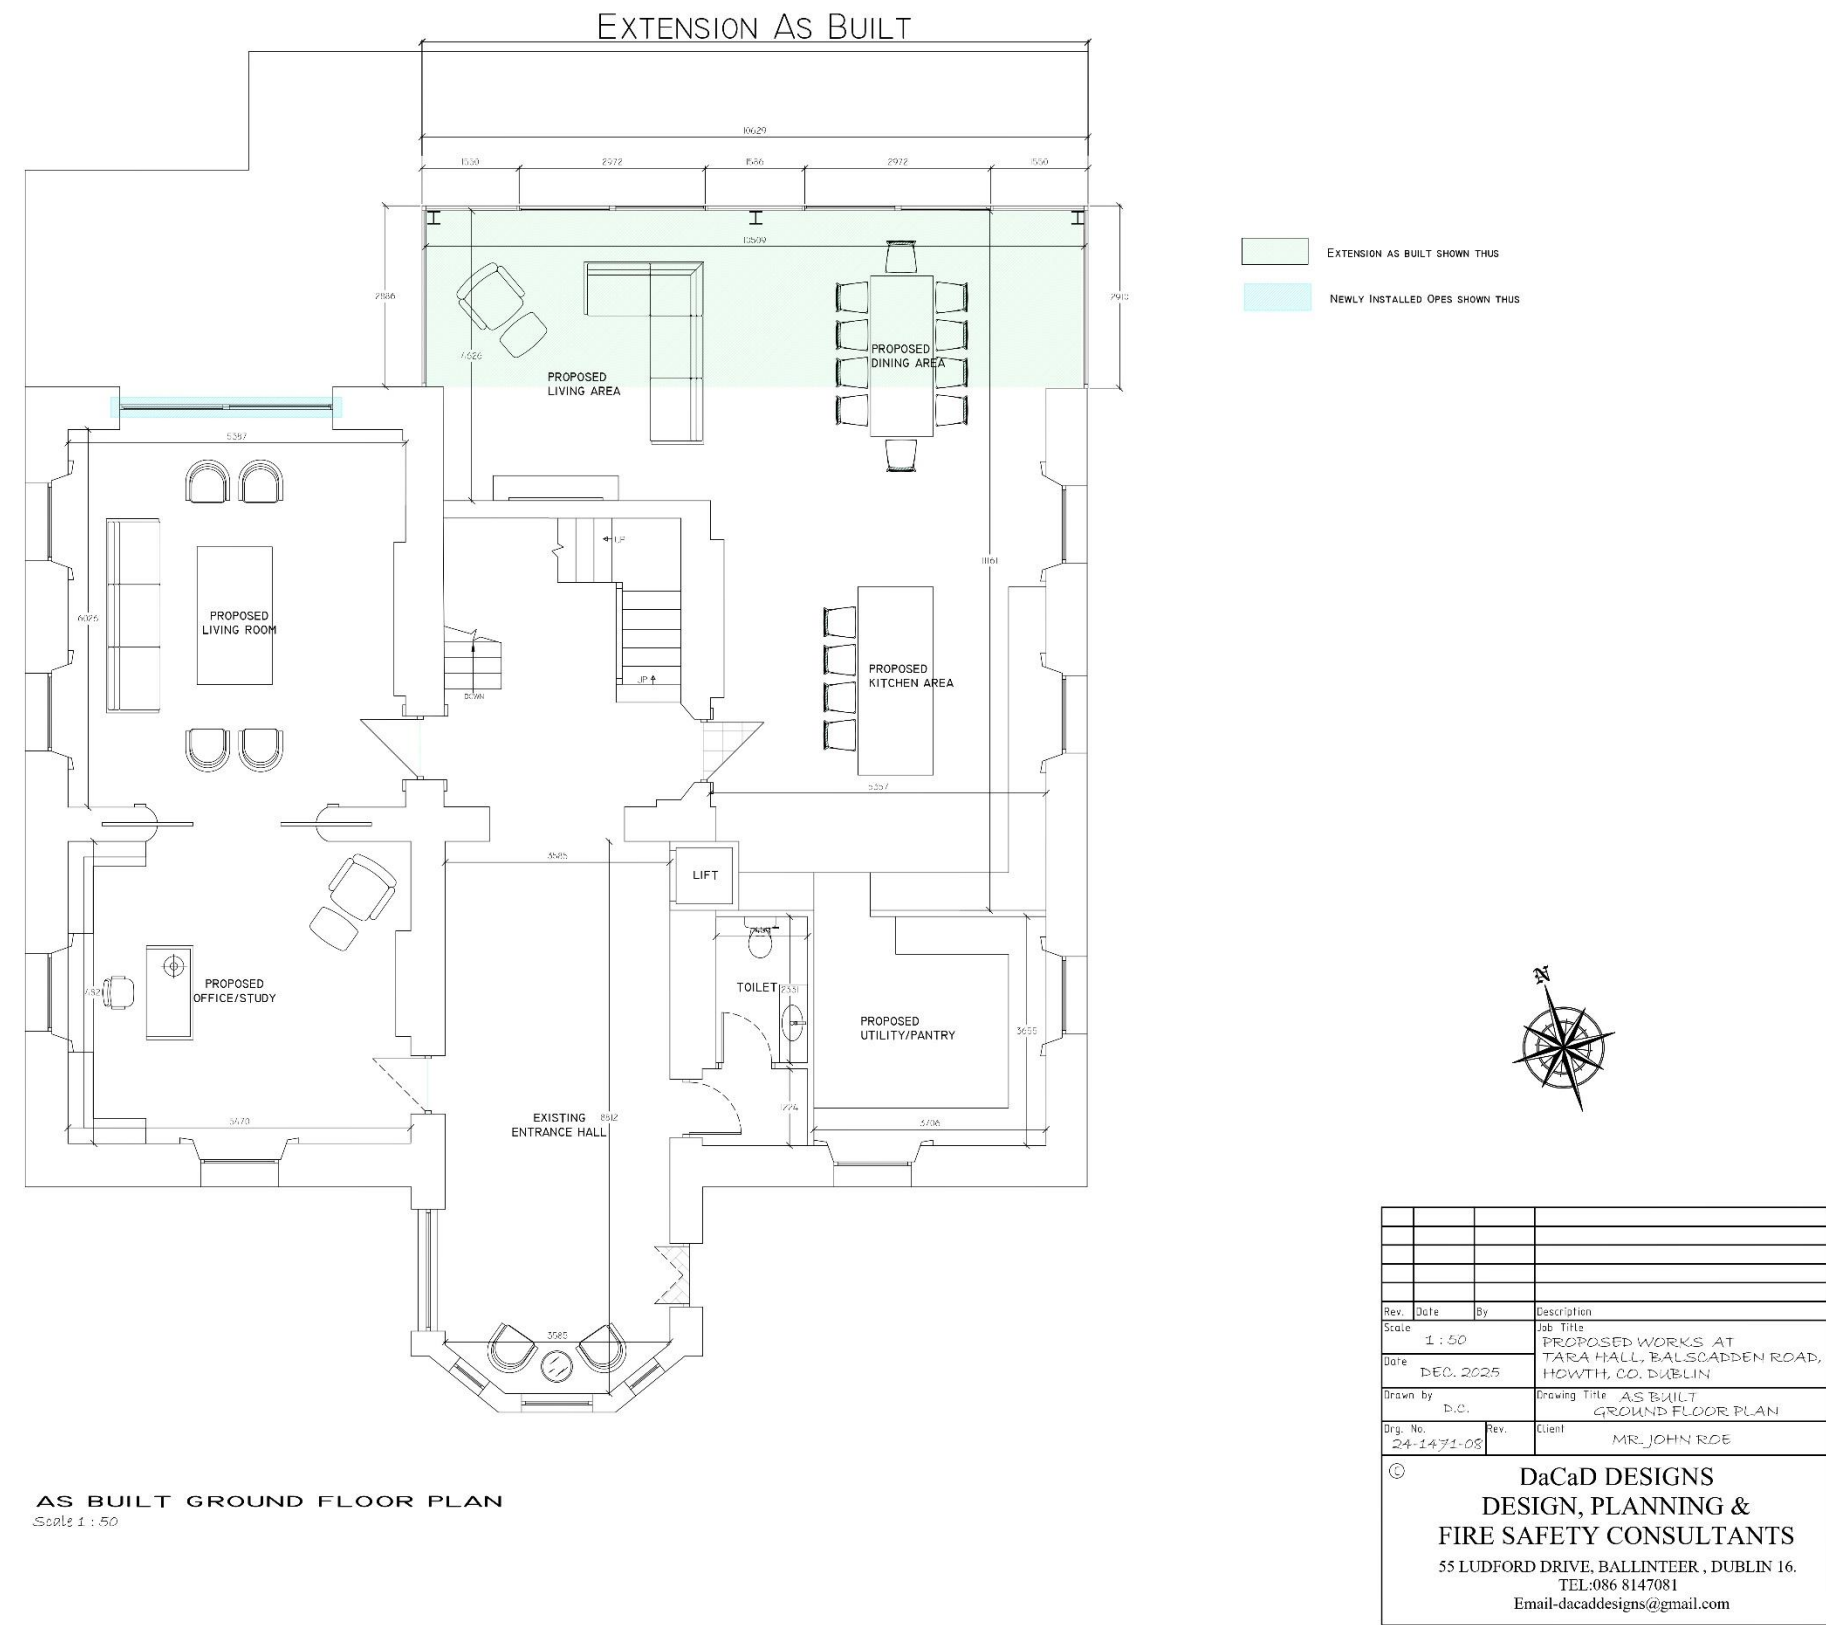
Ground Floor Plan in application for substitute consent (application no. 1)
